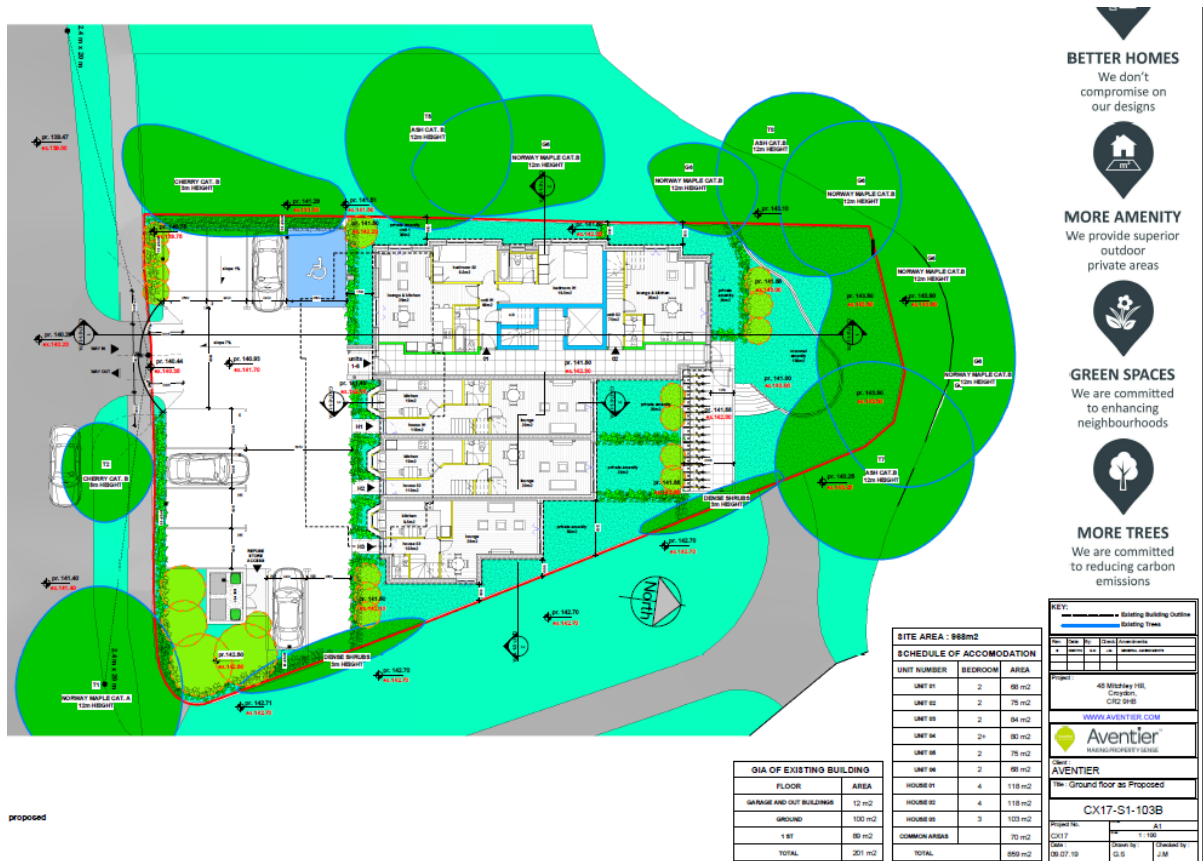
Ground floor plan proposed site showing proposal in relation to neighbouring properties
